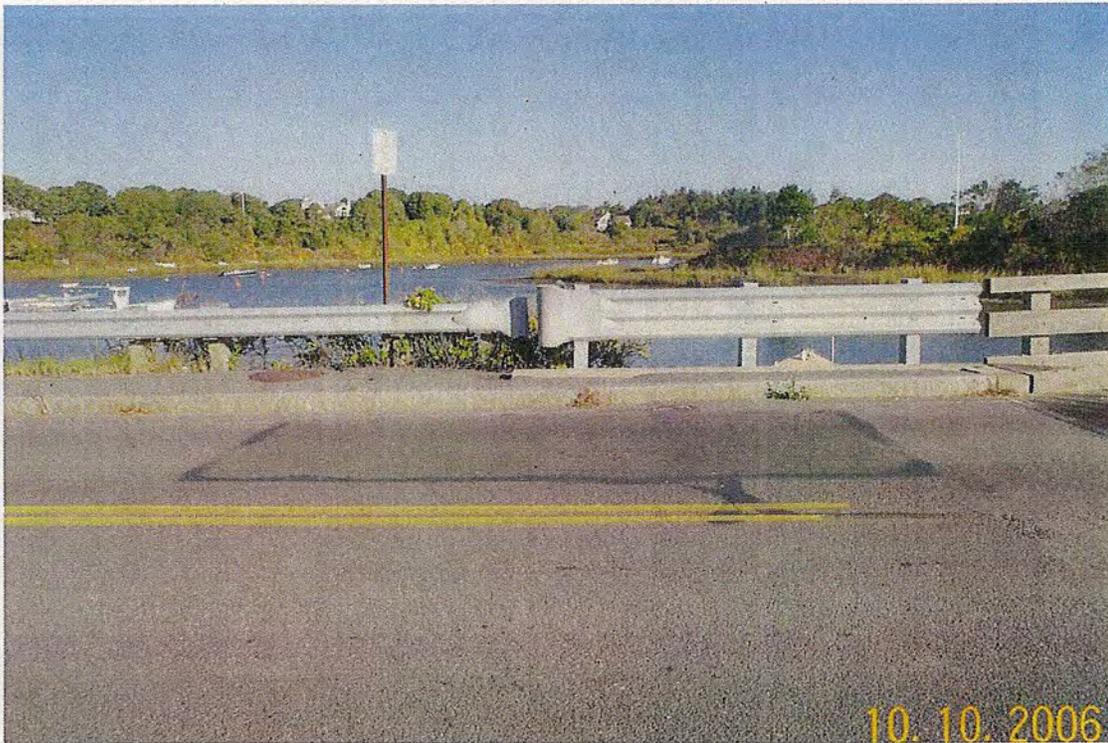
Apparent repair to the westbound lane of the west approach, looking north.
